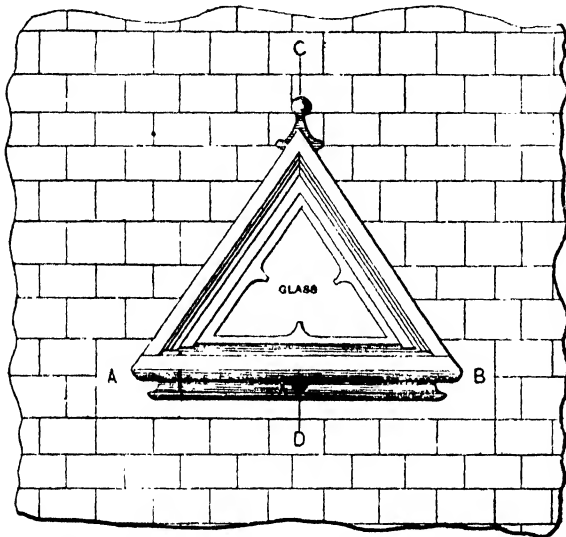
Front Elevation of a Dormer Window on a Pitched Roof
